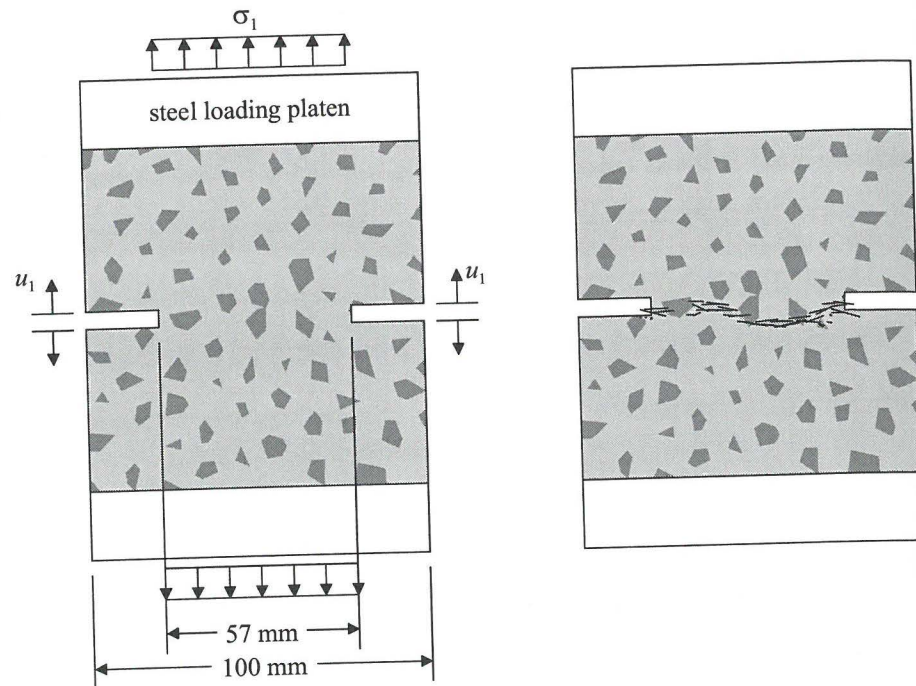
Uniaxial tensile test: test set-up and final failure pattern.
